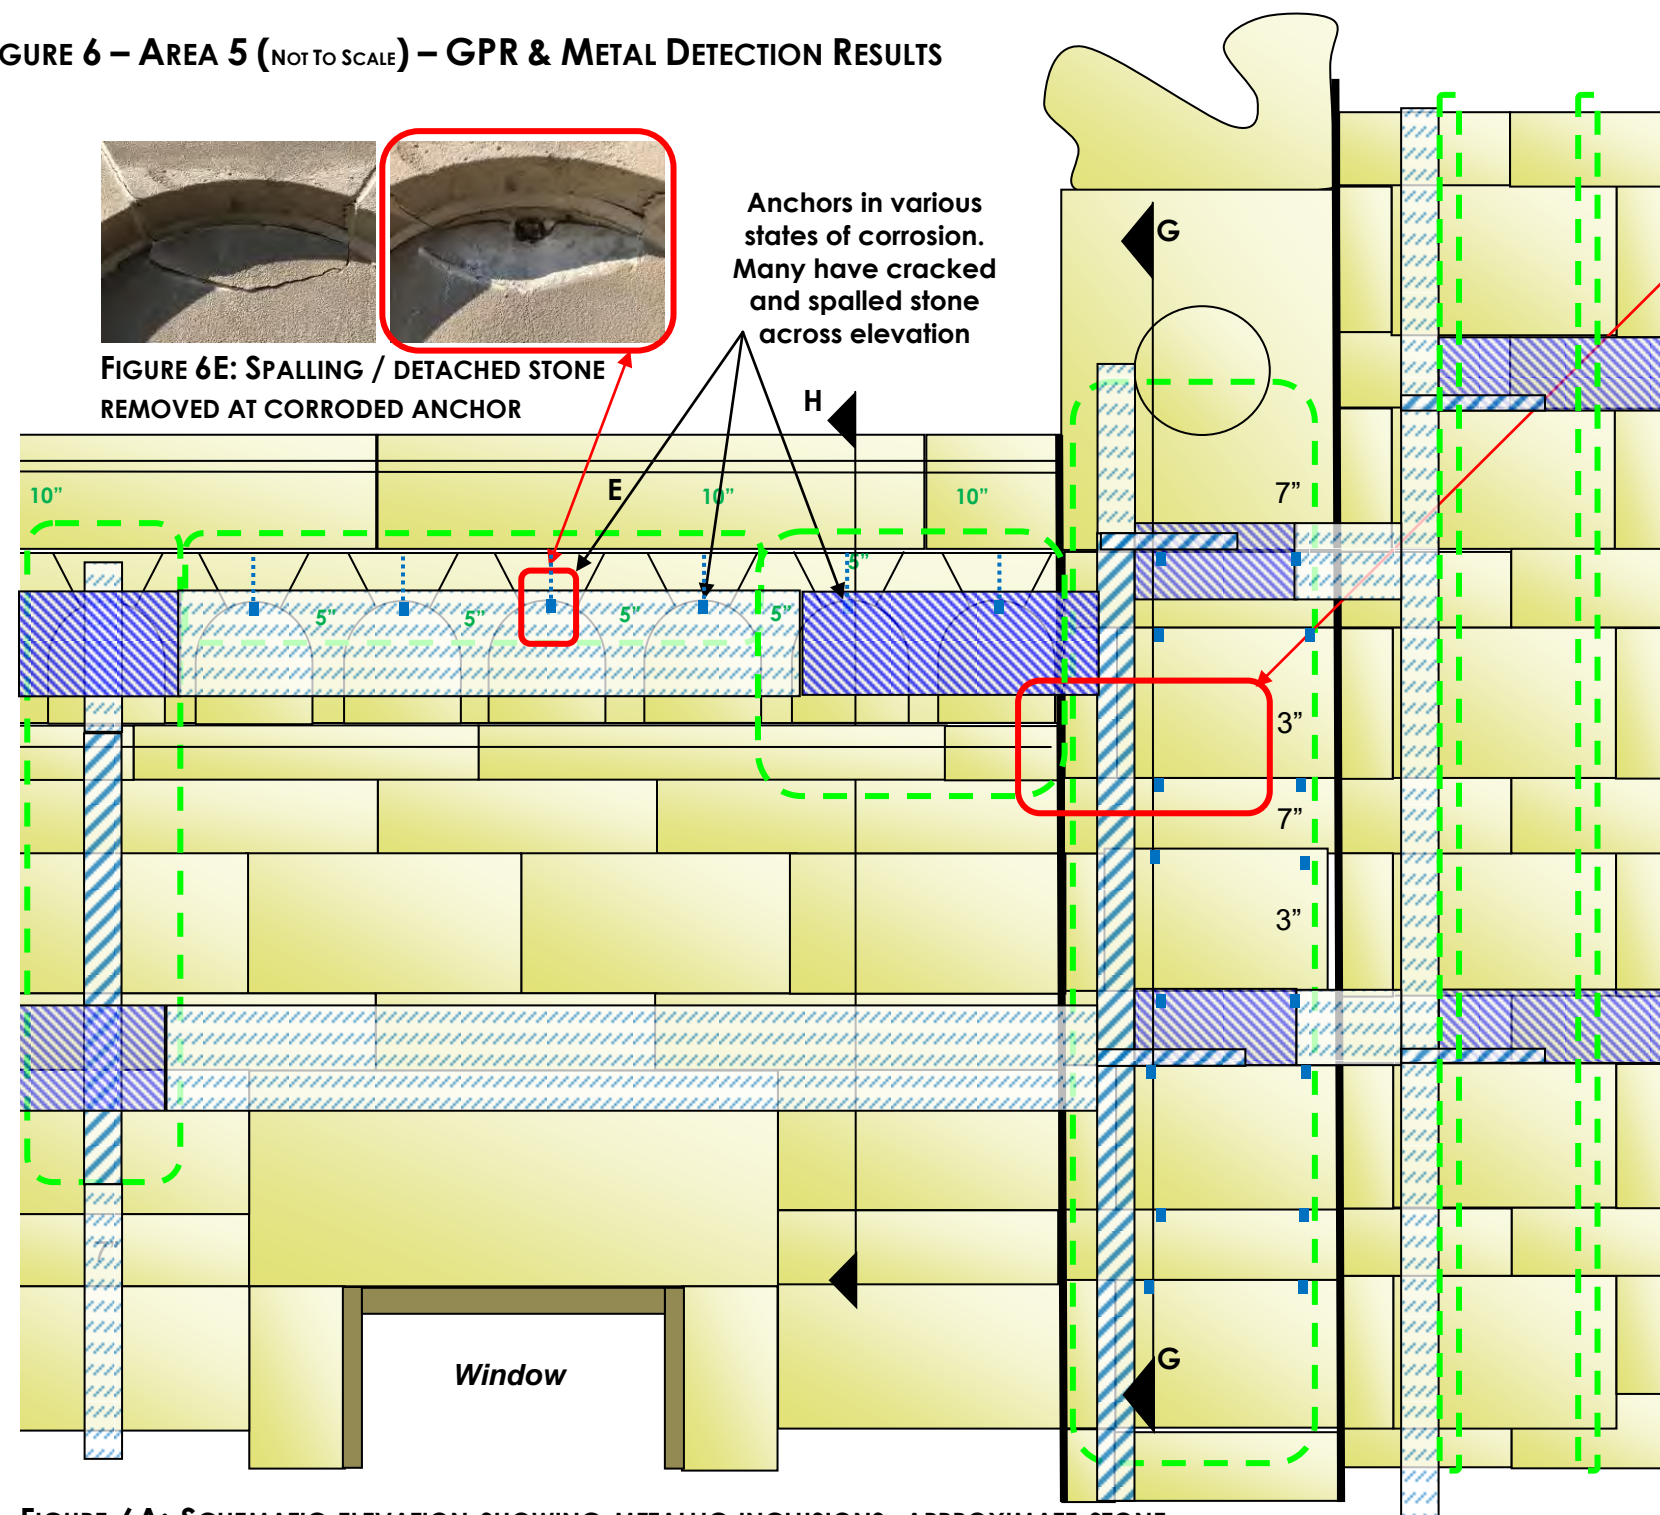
A: SCHEMATIC ELEVATION SHOWING METALLIC INCLUSIONS, APPROXIMATE STONE BLOCK THICKNESSES AND EVIDENCE OF STEEL FRAMING IDENTIFIED AT AREA 6
